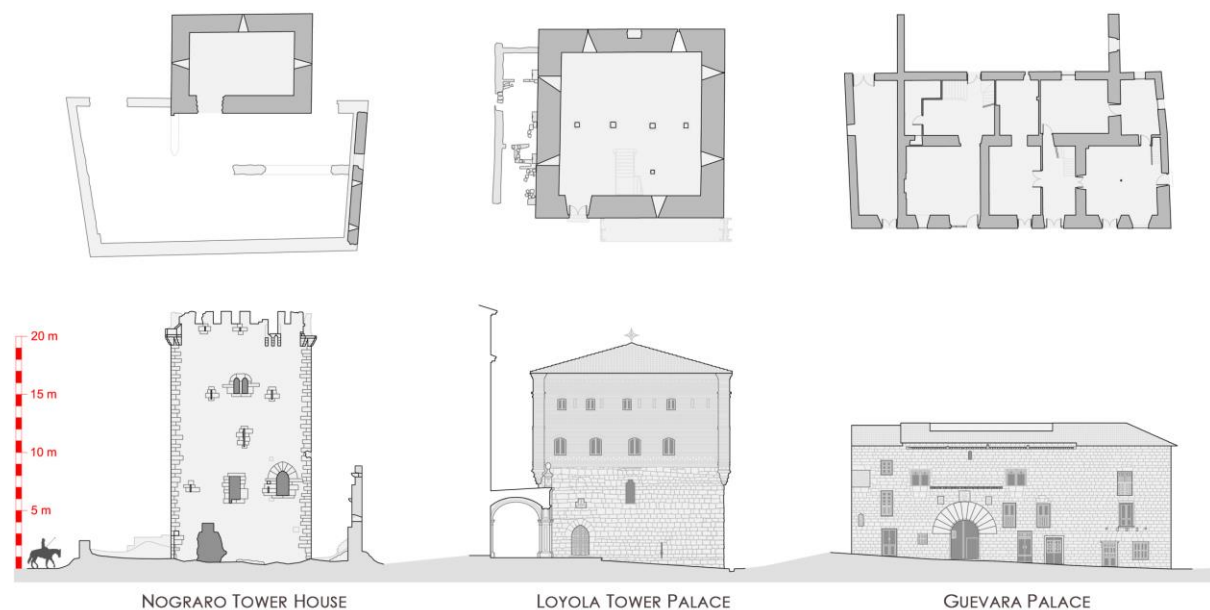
Drawings of the Nograro Tower House, Loyola Tower Palace and Guevara Palace
